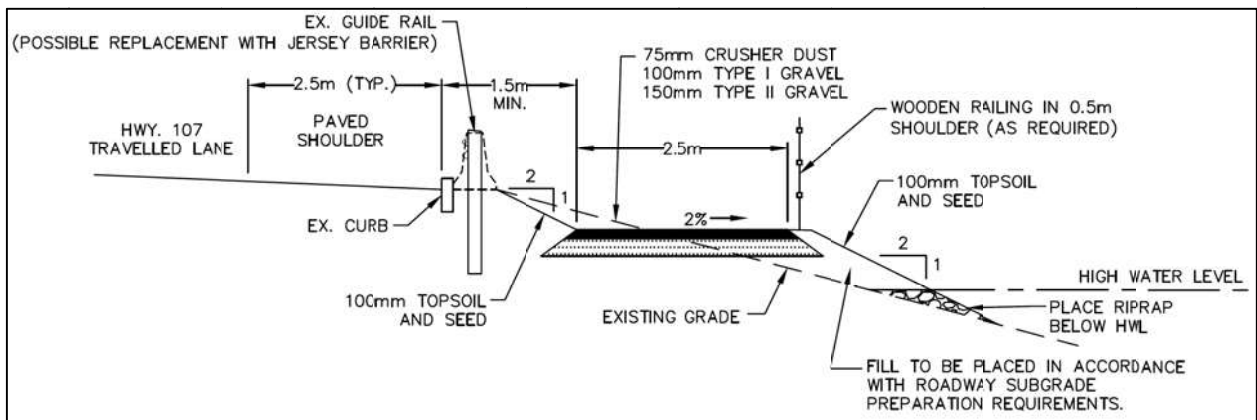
Typical Greenway Cross Section with Restricted Separation from Highway
